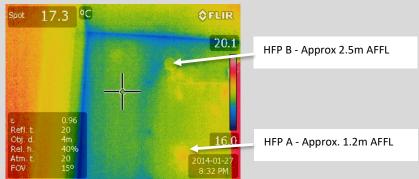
Thermal image of wall under test, highlighting location of HFPs mounted at 1.2m and 2.5m above finished floor level (AFFL).
